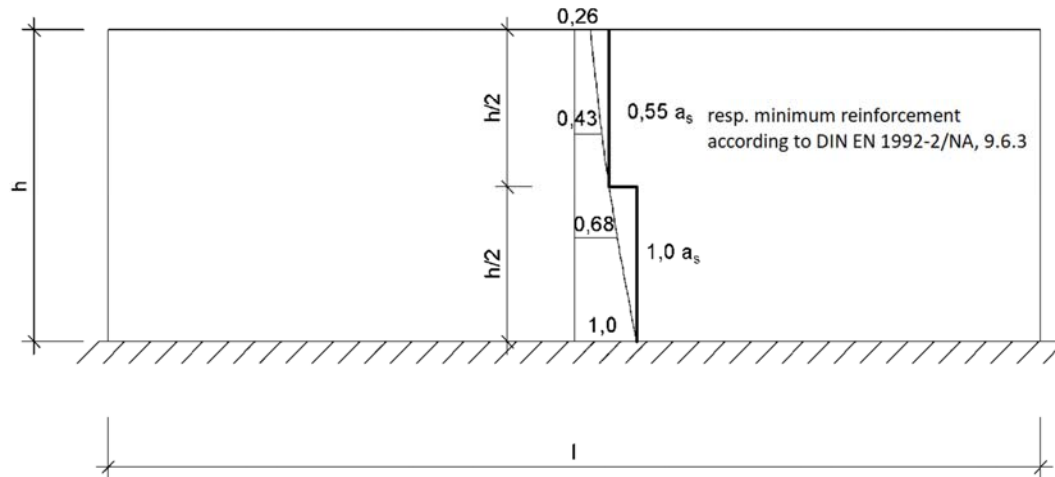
Arrangement of the horizontally reinforcement over the wall height dependent on the tensile stress distribution.
